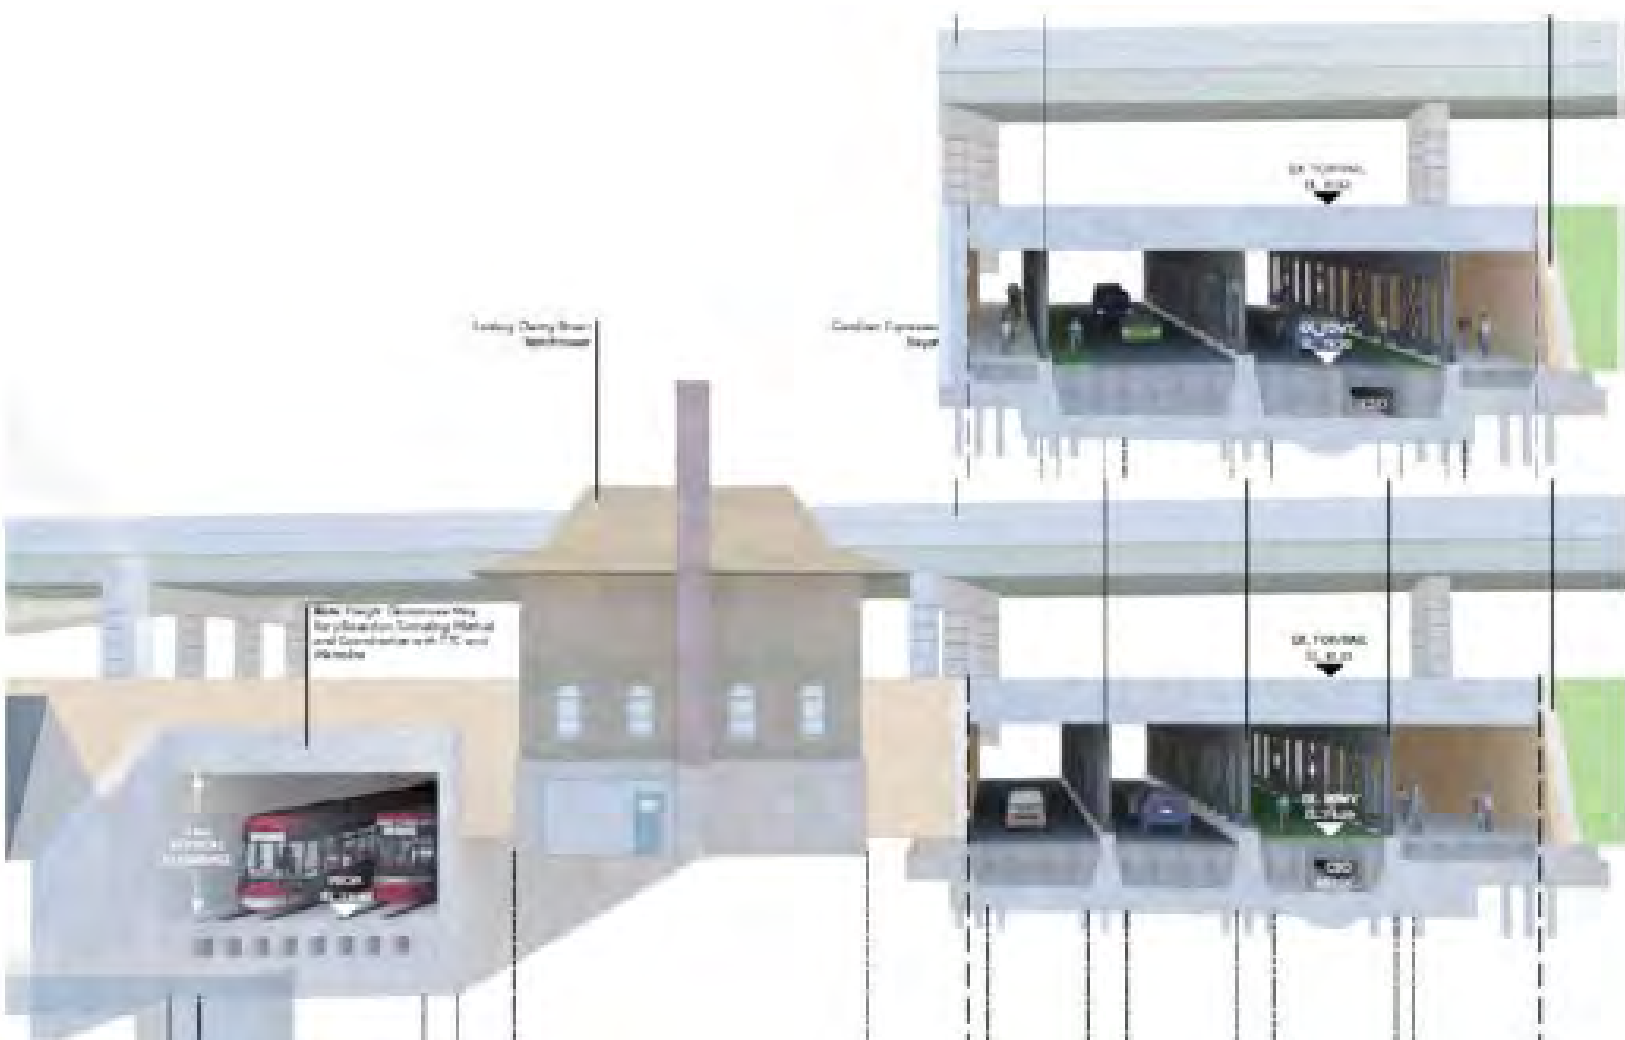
New portal alternative alignment east of Interlocking Tower Location
